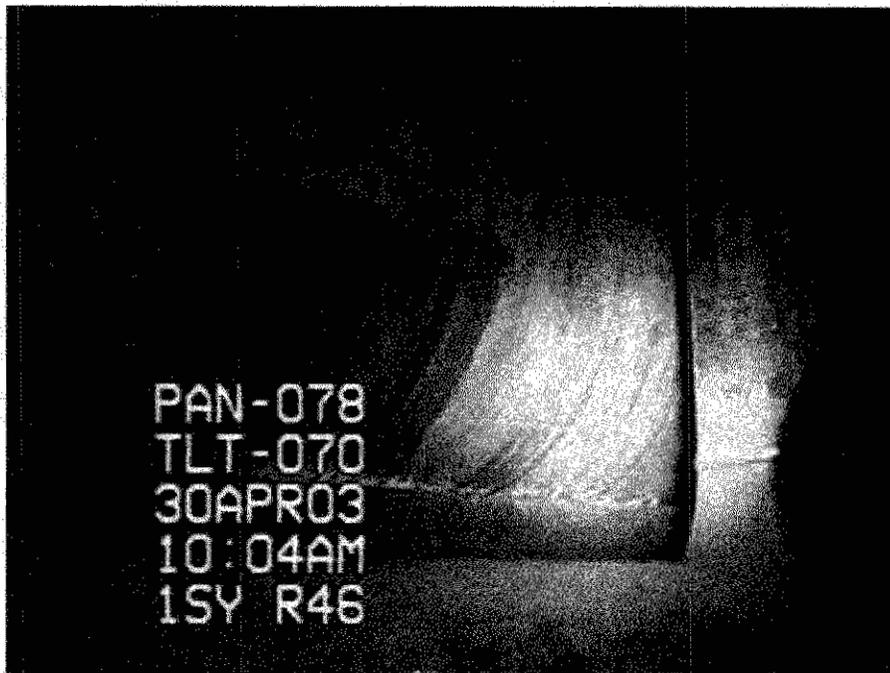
SY-101 Riser 46, Primary Tank, Knuckle Weld (2003)
